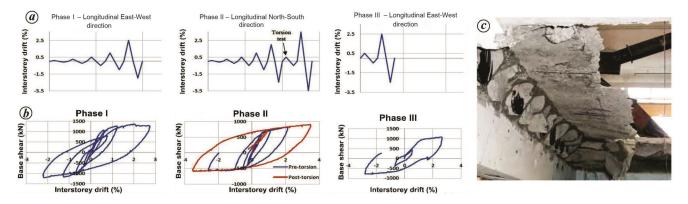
Performance of the super-assemblage test⁴⁵: a, Loading protocol; b, Hysteresis loop; c, Failure mode showing starters and end of the HC units remain attached to the east beam.
